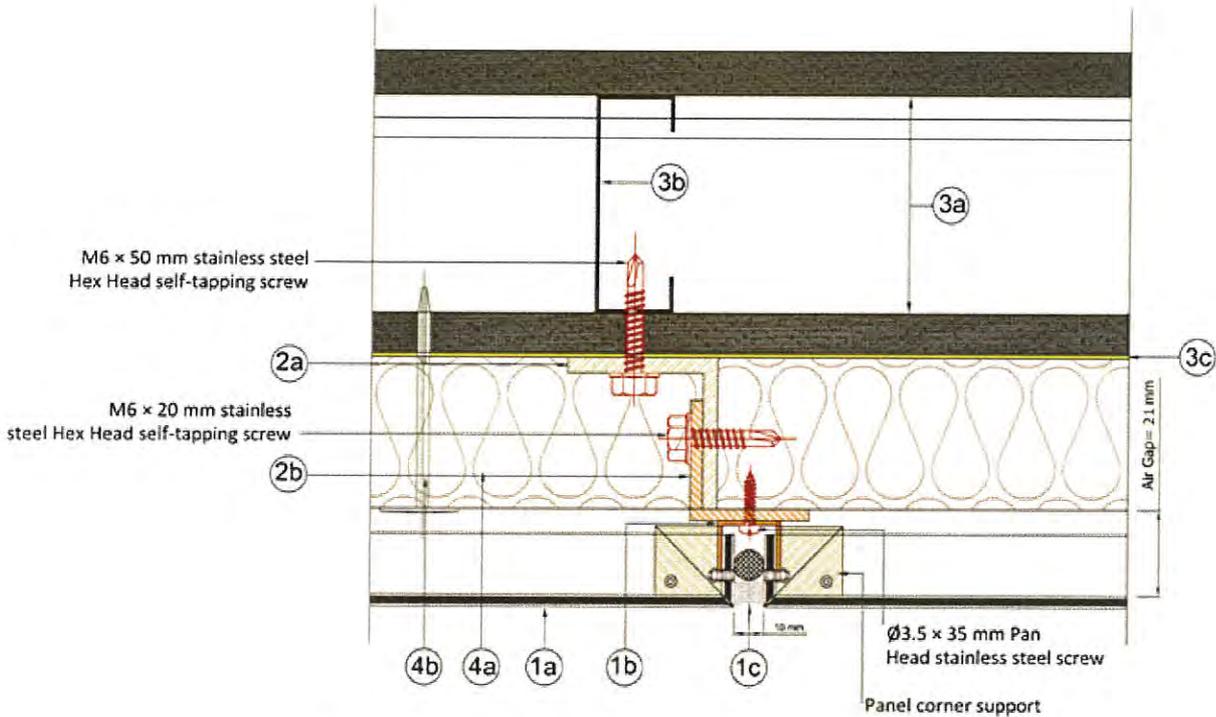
"Alucopanel® A2" 4 mm thick Aluminium Composite Material "Close-Joint" Non-Loadbearing Exterior Wall Cladding Assembly horizontal section details
